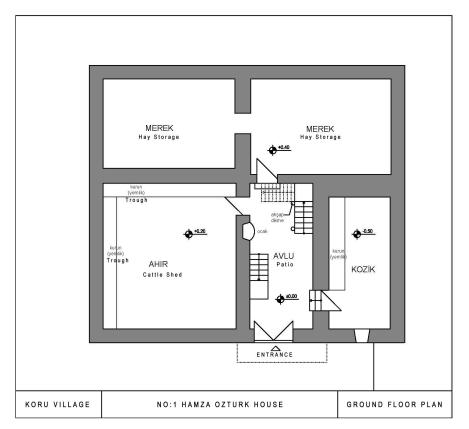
Ground Floor Plan of Hamza Öztürk House.
